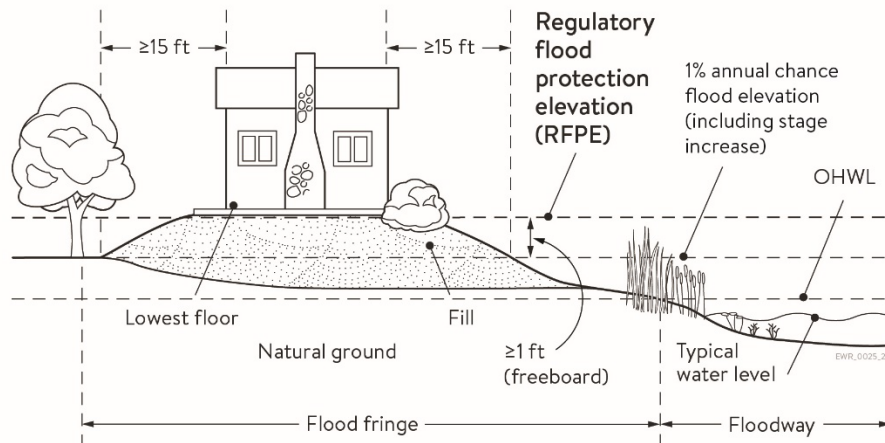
C-3: Overview of fill standards for residential structures.
